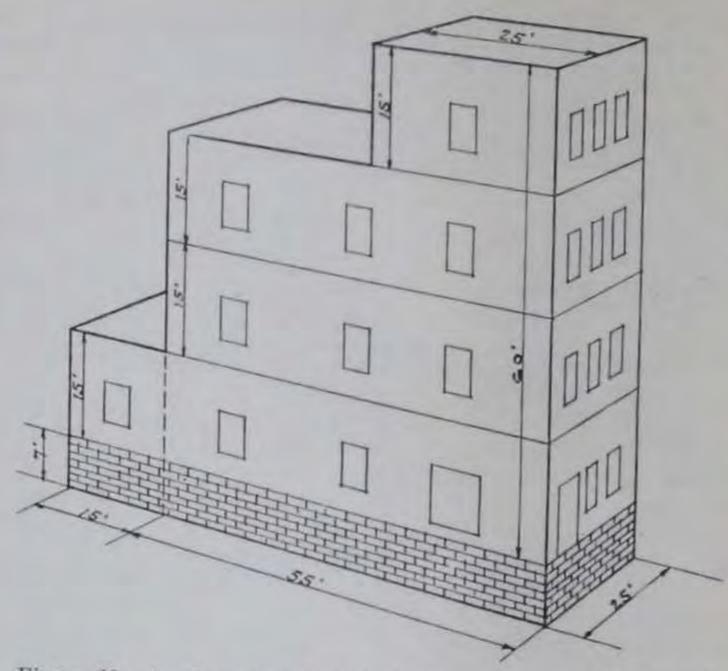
Irregular Height Building, Showing Method of Cubing Same.
